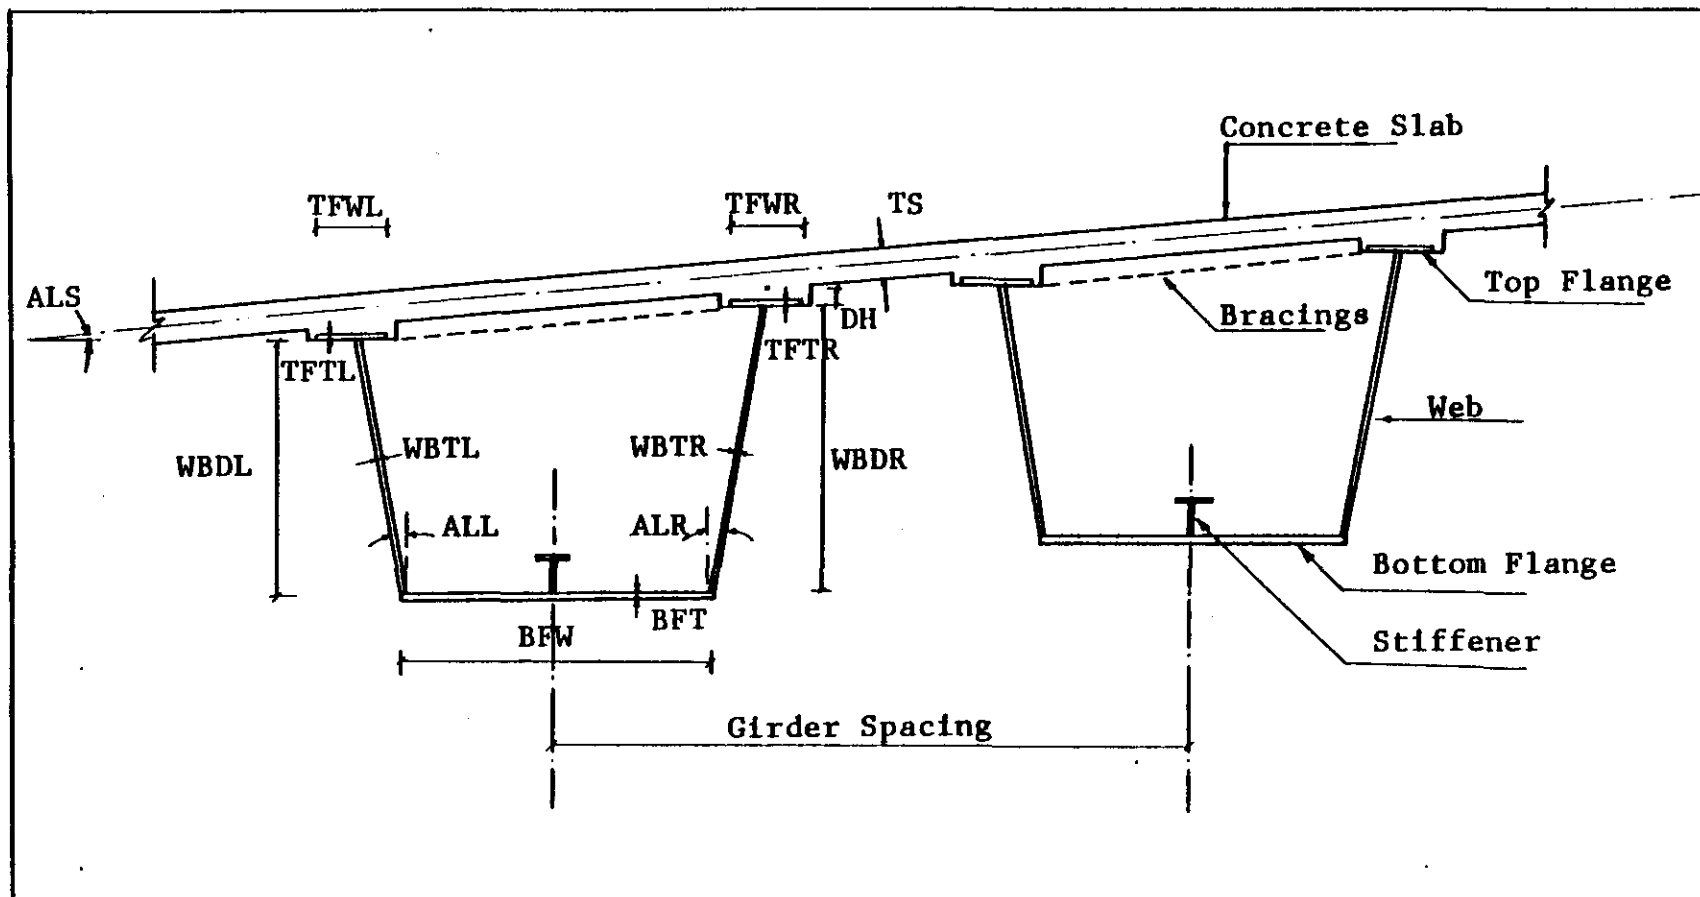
Typical Cross-Section of a Steel Box Girder Bridge Deck
